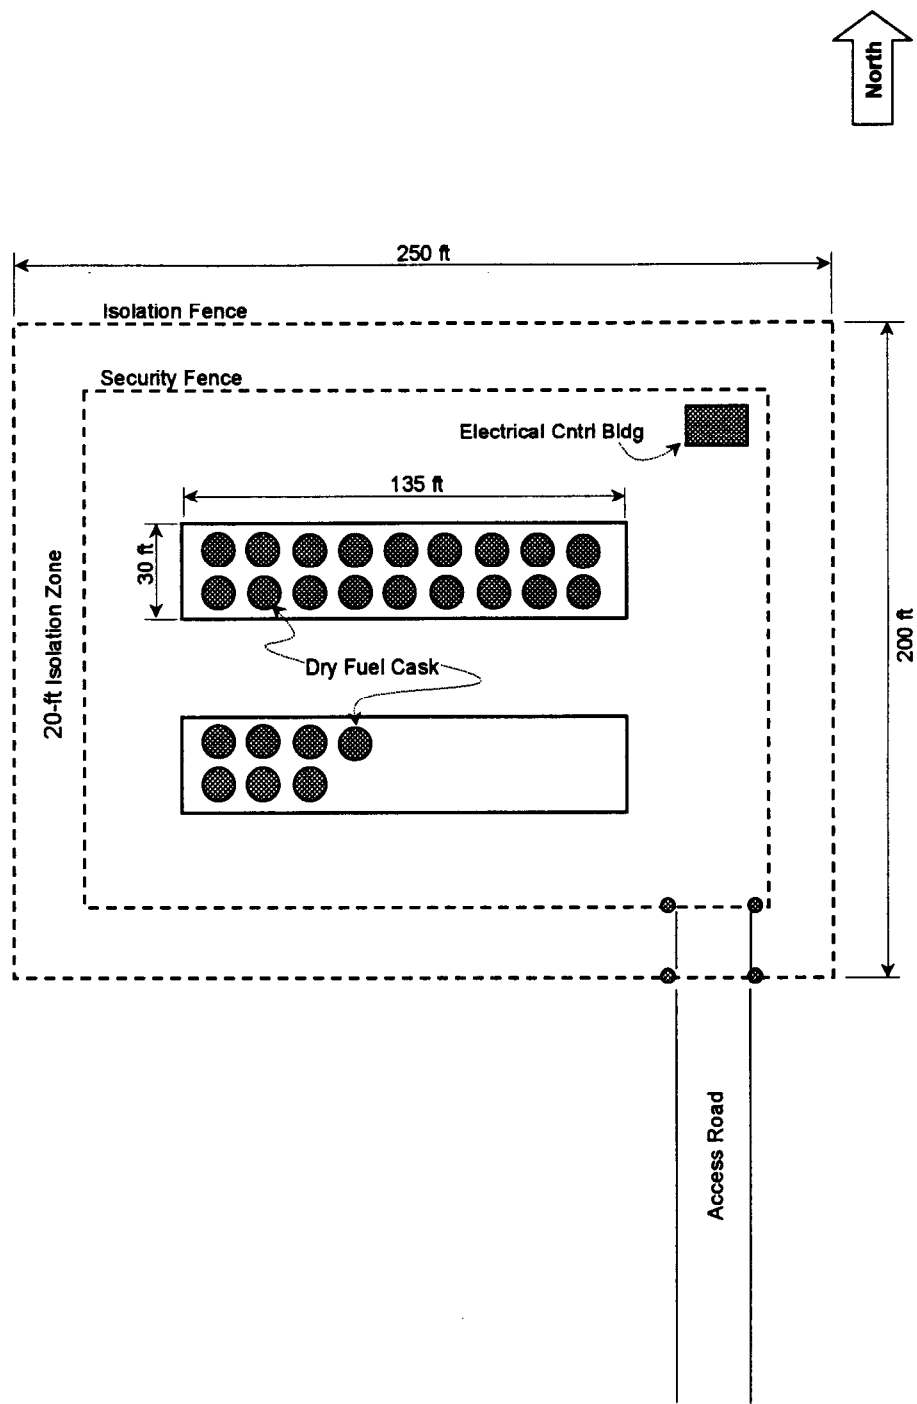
WNP-2 Dry Cask Storage Facility Two-Pad (First Phase) Layout
